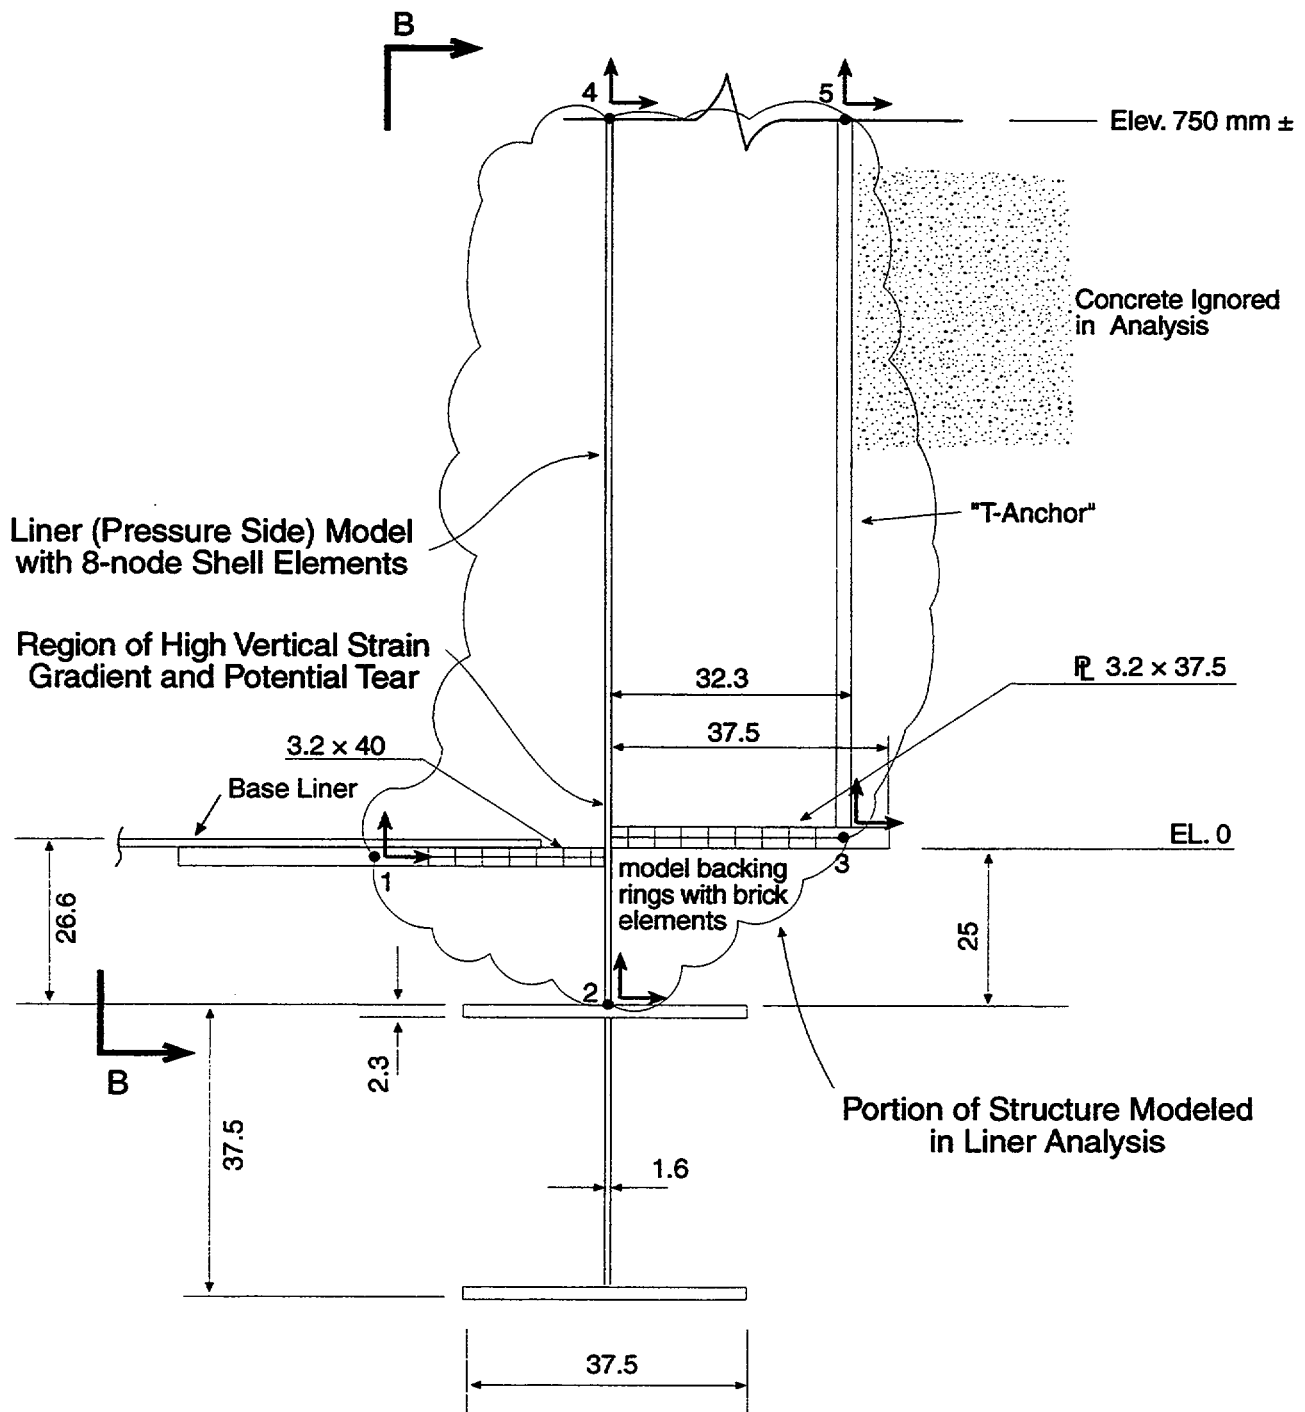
Wall - Basemat Liner Connection Region (Section View)
